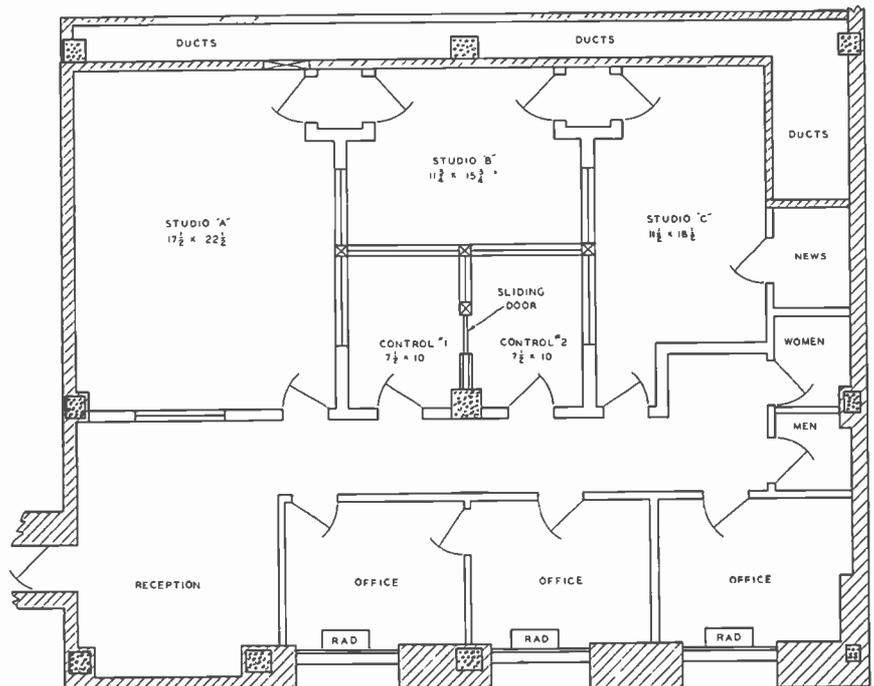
(below). Floor plan of WBCK studios A, B and C which are served by control rooms #1 and #2.
